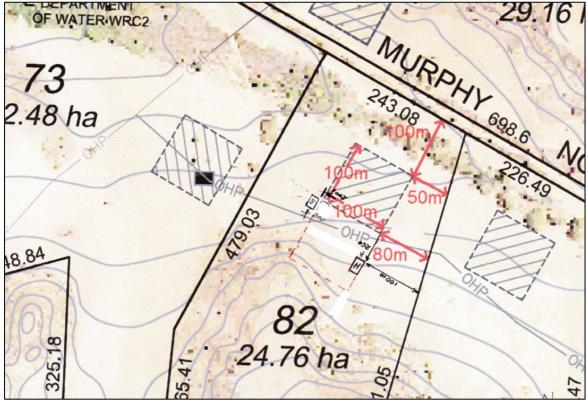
(c) – Original Site Plan for Residence & Outbuilding upon 60 (Lot 82) Murphy-Norris Road, Narra Tarra
